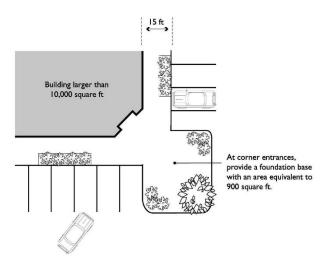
A.1.B: FOUNDATION BASE WITH CORNER ENTRANCE
